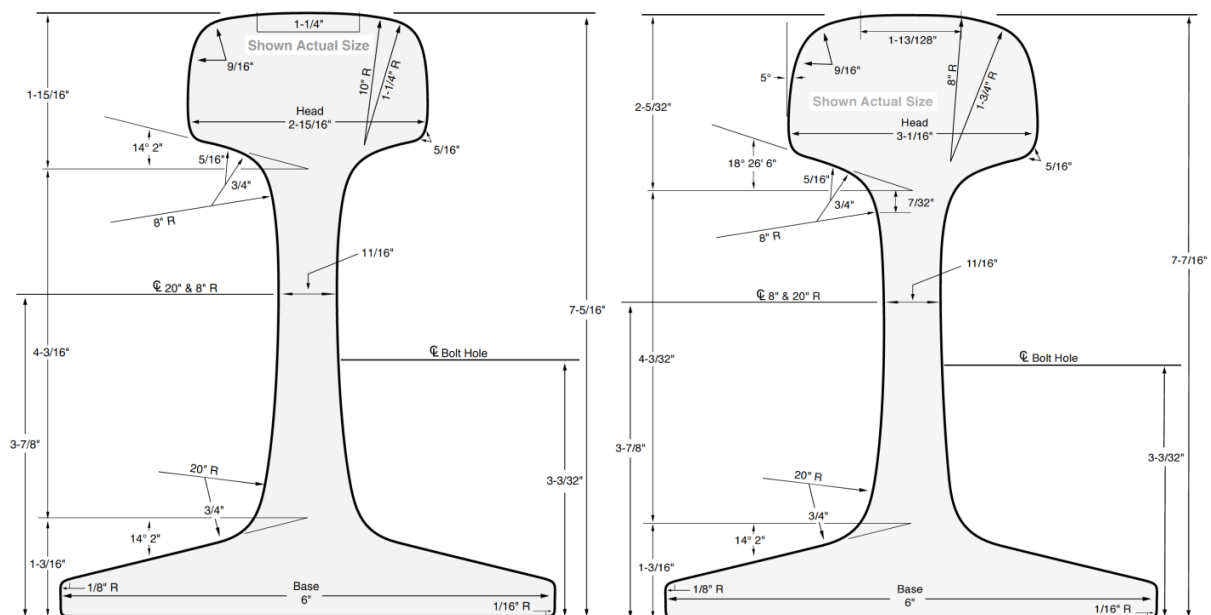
Sketches of AREMA 136RE (left) and 141RE (right) rail profiles
